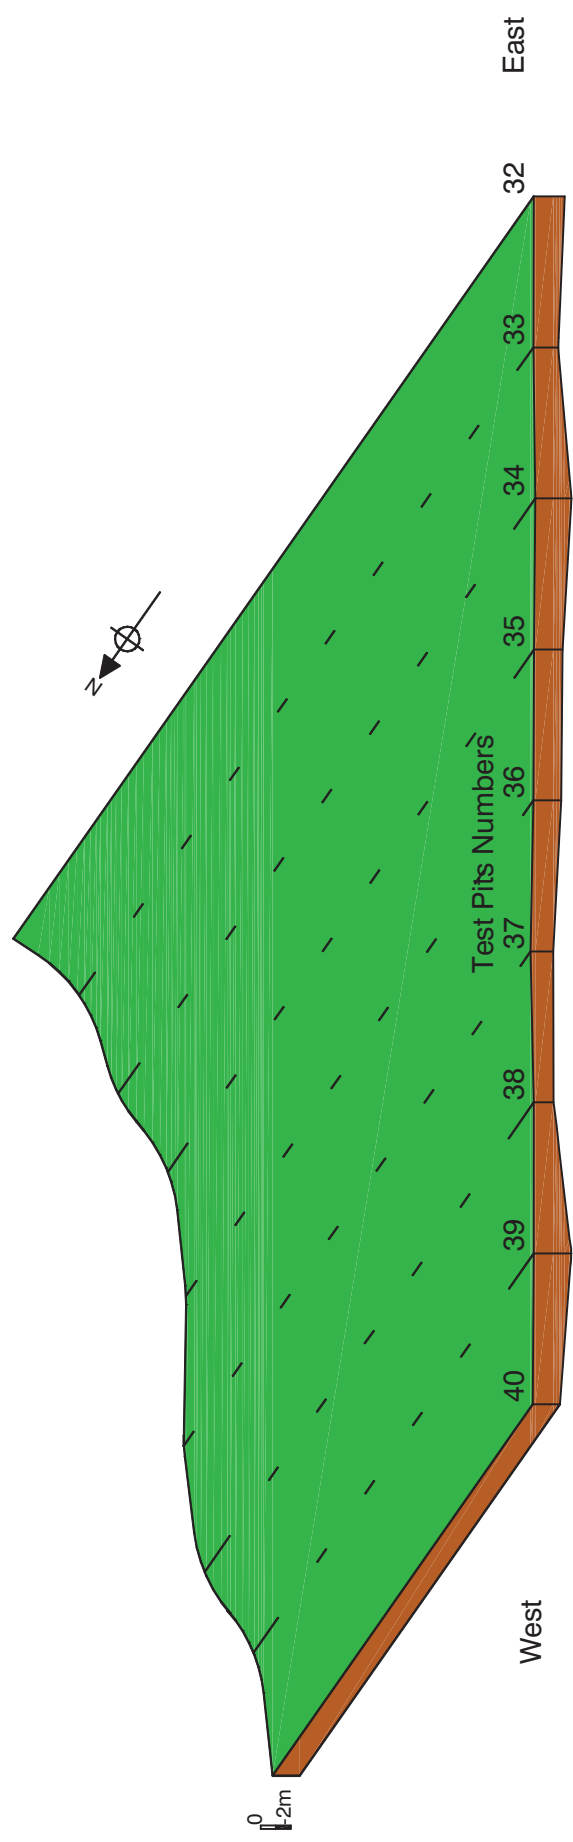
Section across the site. Horizontal scale 1:2000, vertical scale 1:500
